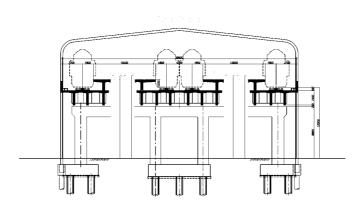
Typical Cross Section of Station Structure (Two-layer Structure)
